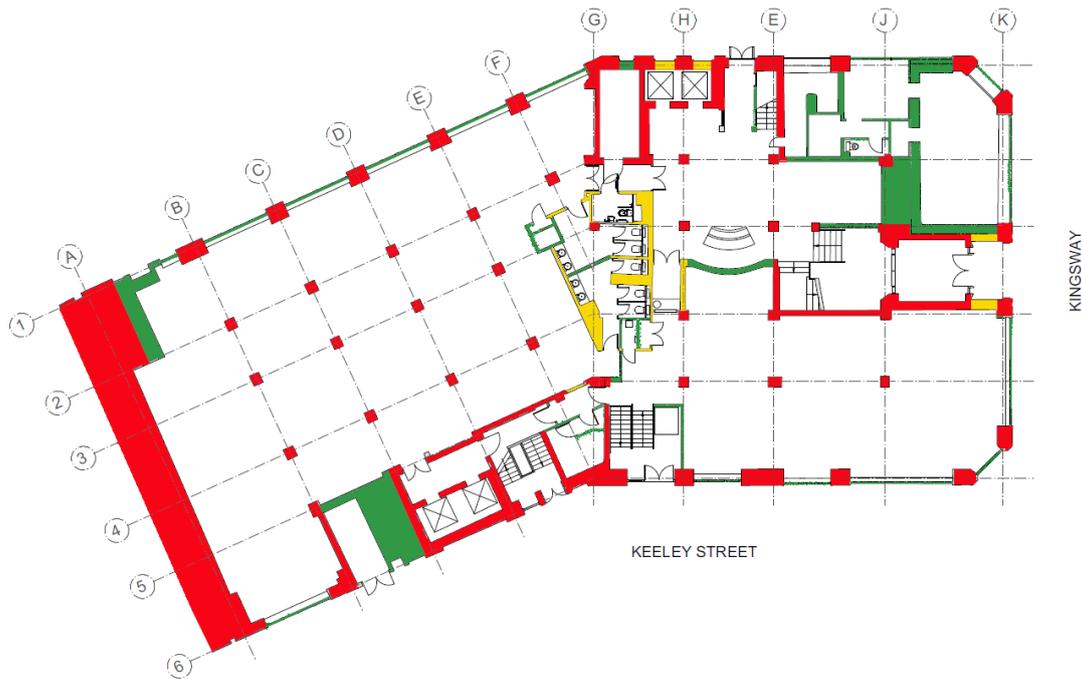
Ground floor significance plan. Note at this level, the entrances to the Kingsway facing shops has been moved multiple times, originally being within the marble vestibule. On Keeley Street the original loading bay door has been converted, internalising the space and an additional staircase and access point has been installed to the east of the original staff staircase. Note the enclosure surrounding the stair landings at this level have been altered, with the loss of the half the wall adjacent to the stairs.
